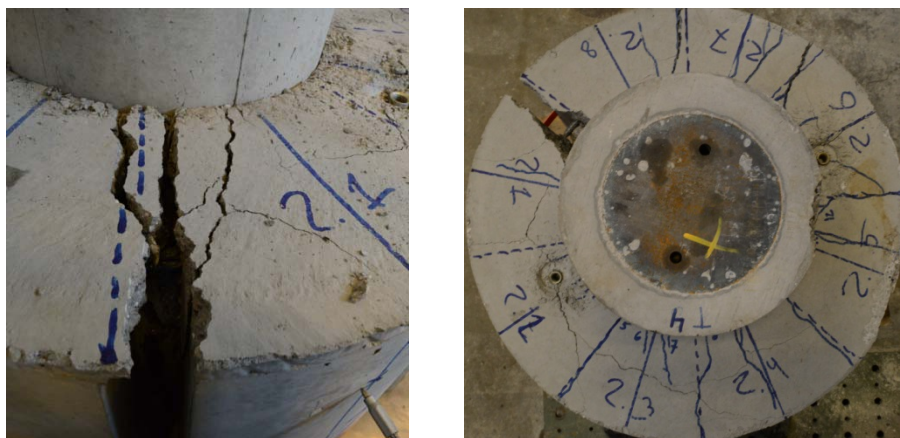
Crack patterns and location of stirrup rupture in sleeve, top view of specimen 2-L-D.
